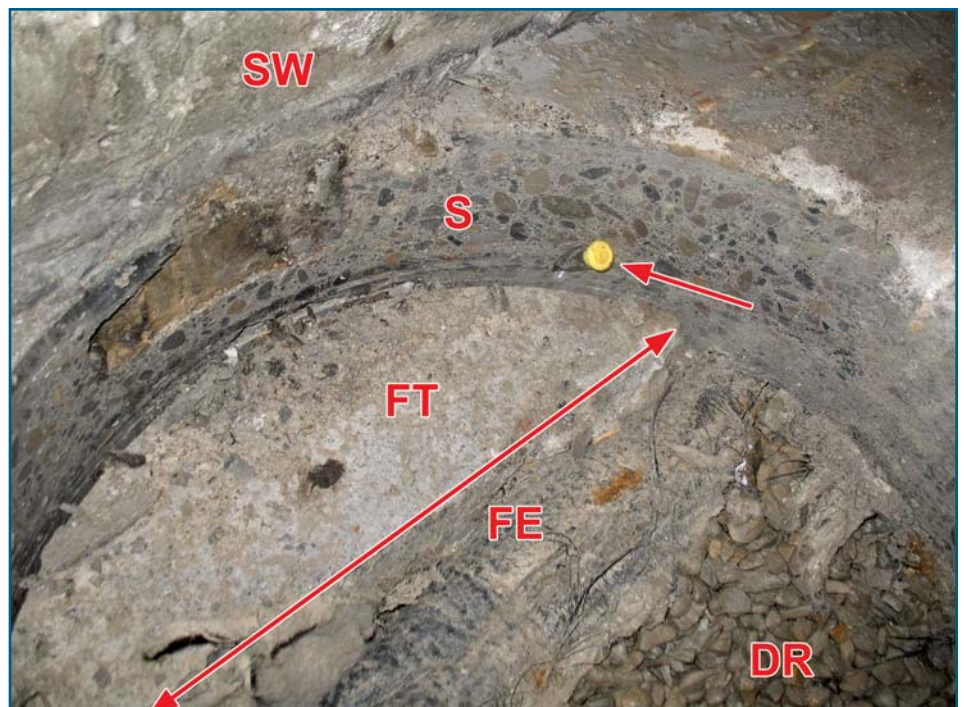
Screwdriver (yellow top) in grout injection hole (arrowed). SW – stem wall; S – floor slab; FT – footing top; FE – footing edge; DR – drain rock.
